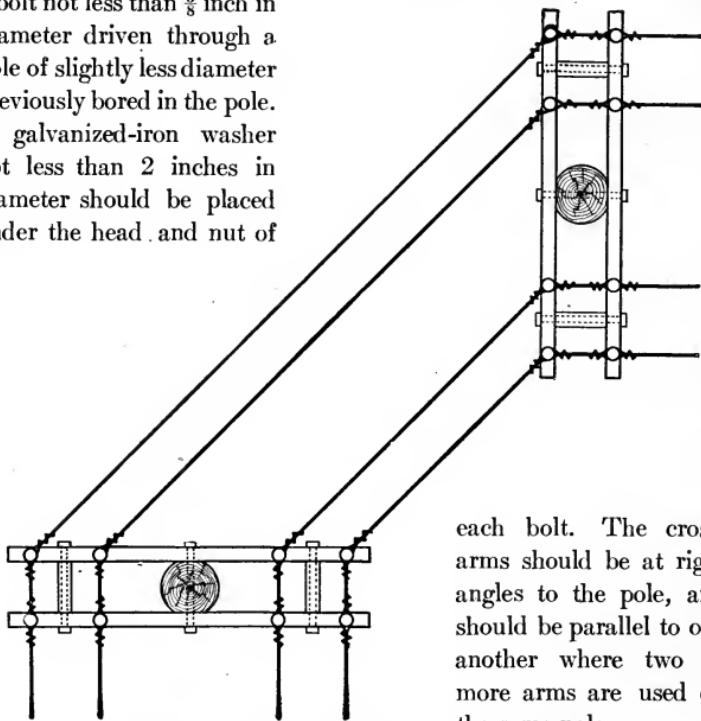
Two-Poles Used in Making Turn on Heavy Line.
